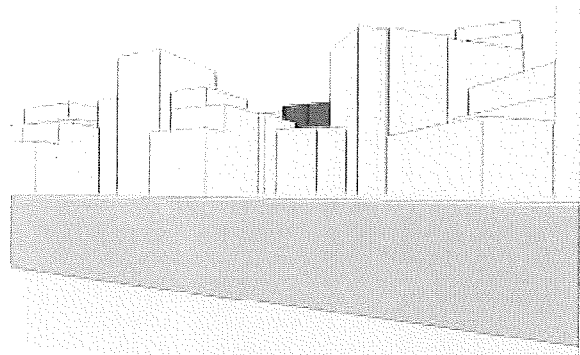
Connecting Bridge between Buildings 1 & 200. Approximate distance 115 feet to north wall of building 203. The addition will not be visible above the Bridge. (Source: Interactive Resources, Inc.)
